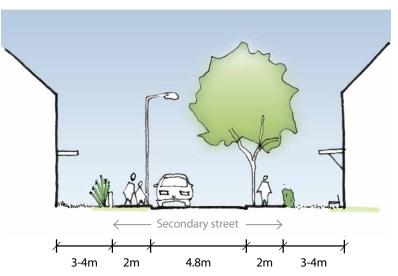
C-C – typical secondary street cross section (refer to Figure 19 for section location)
